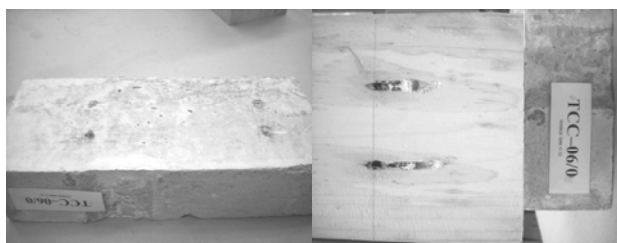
Specimen failure: concrete (left) and timber (right) parts pulled apart at the end of the push-out test
